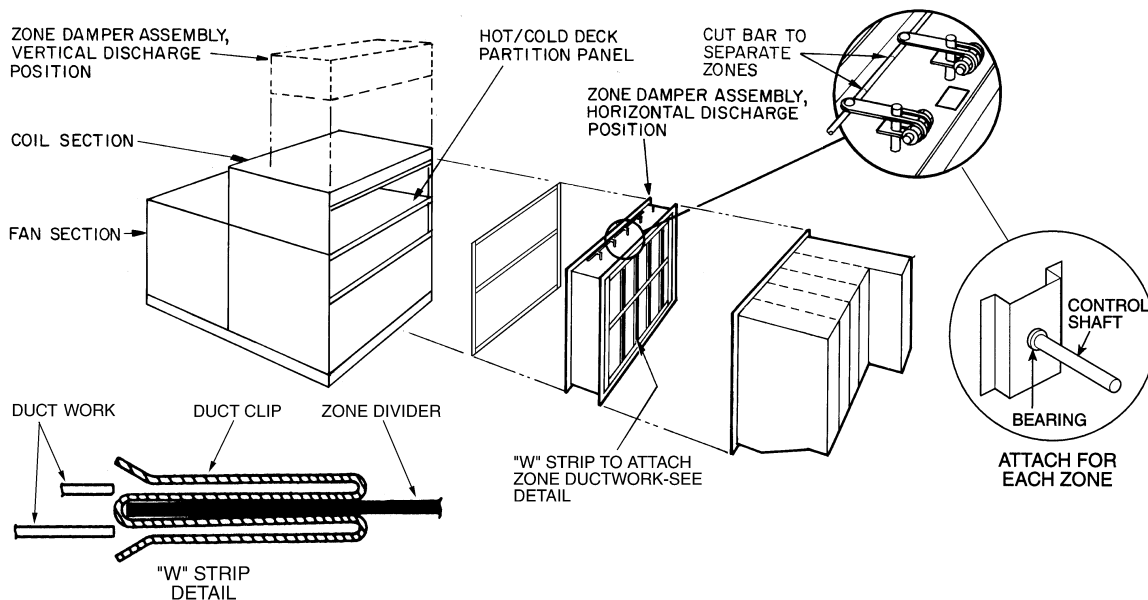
Zone Damper Assembly Details (Horizontal Discharge Shown)
